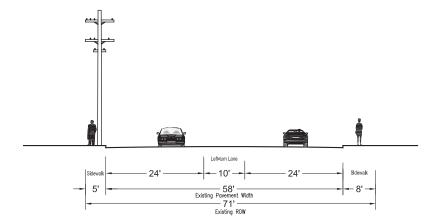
TYPICAL SECTION - ARROW HIGHWAY
